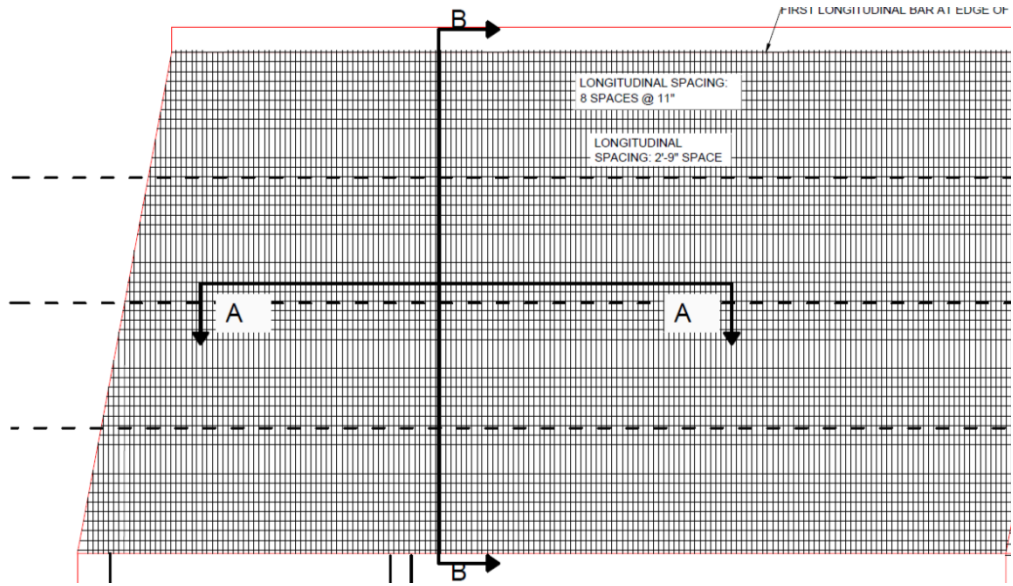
(Cont.) Bridge A0569 Deck Cross Sections
